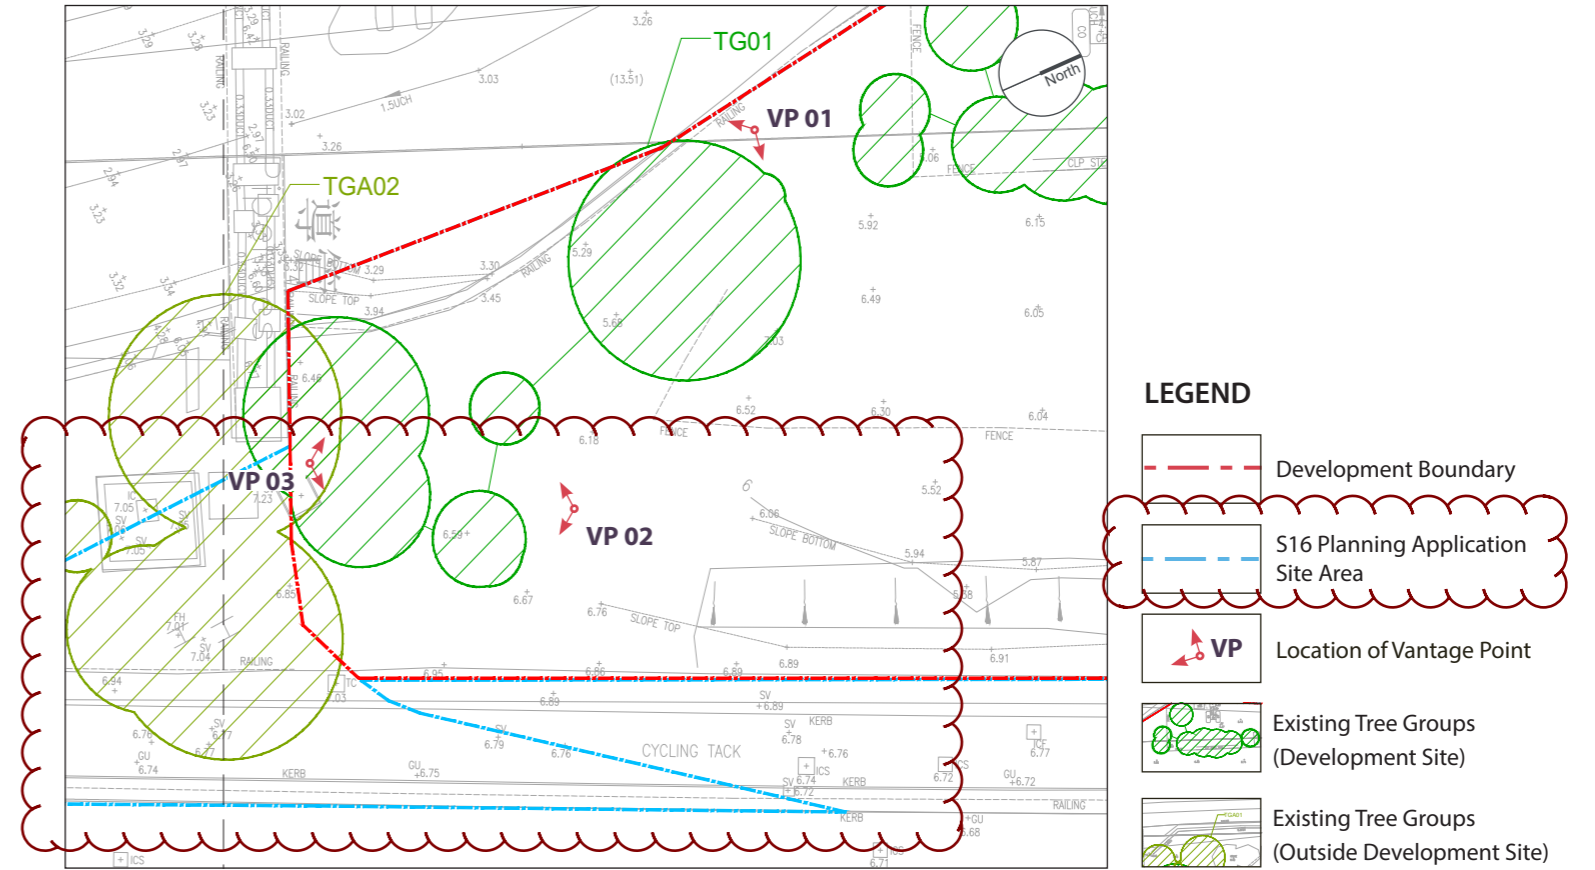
FIGURE TITLE Proposed Residential Development at Lot 531RP, 532SDRP & 532RP in DD 130, Lam Tei, Tuen Mun Tree Group Location Plan	SCALE	AS SHOWN	DATE	SEPT 2025
